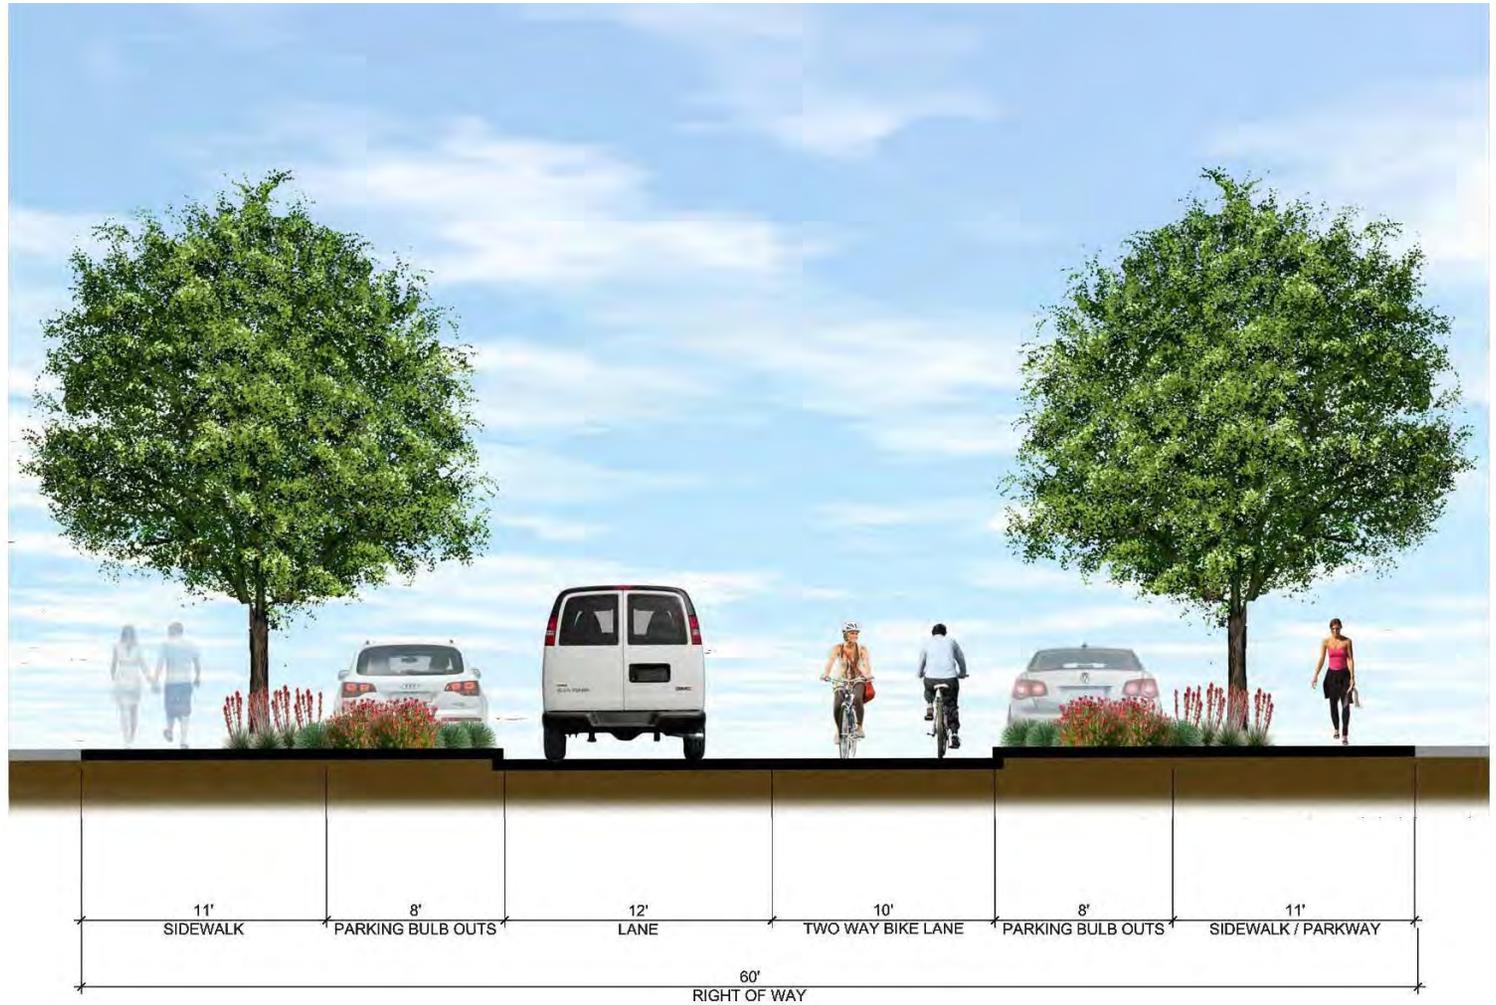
Bradford Avenue Looking Southbound from Center Street Cross Section
